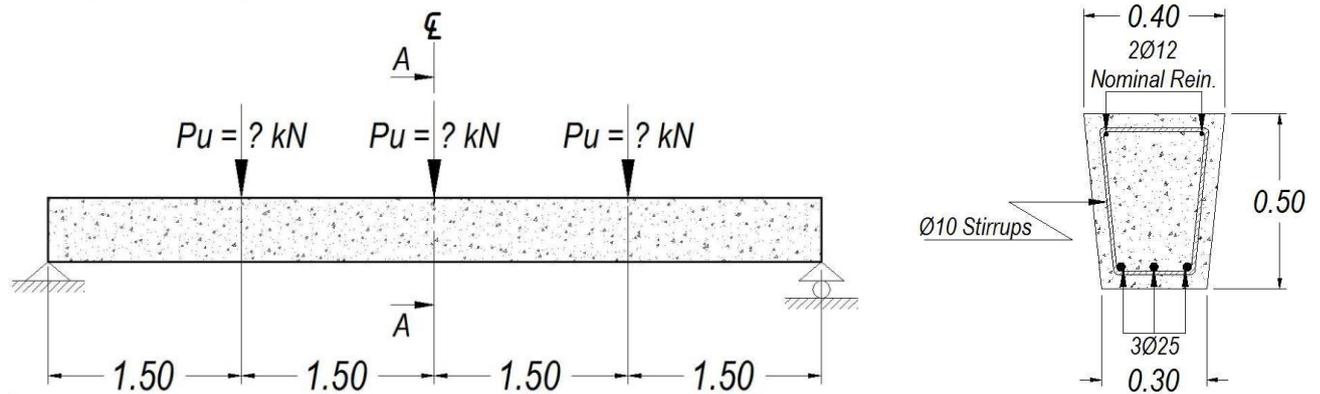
Trapezoidal beam for Example 4.10-3.
